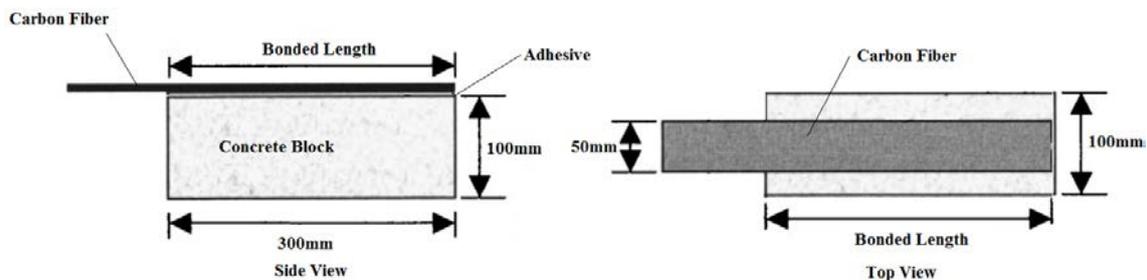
Specimens for bond test of CFRP fabric to concrete.
